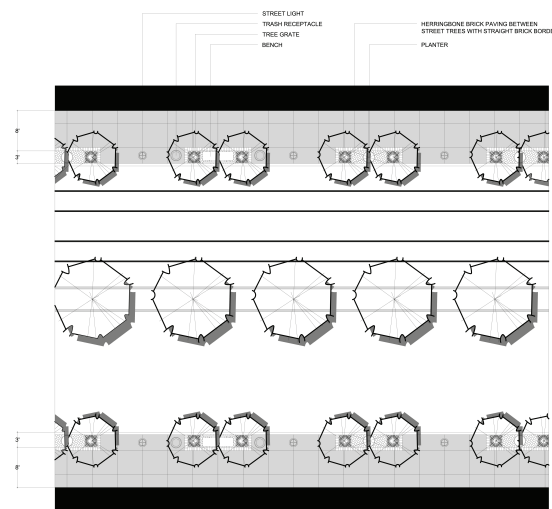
Major Thoroughfare (without loading dock) Plan
